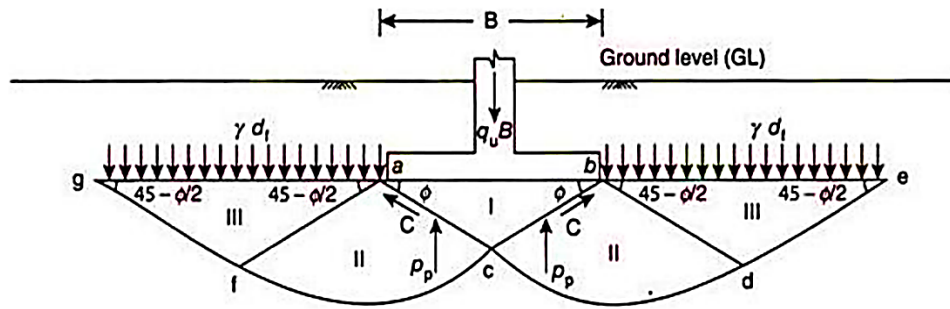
Failure plane of a shallow foundation (Terzaghi, 1943).
